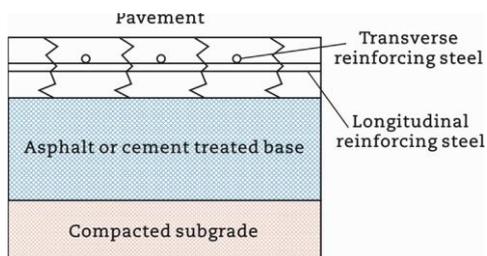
CONTINUOUSLY REINFORCED CONCRETE PAVEMENT [13]
